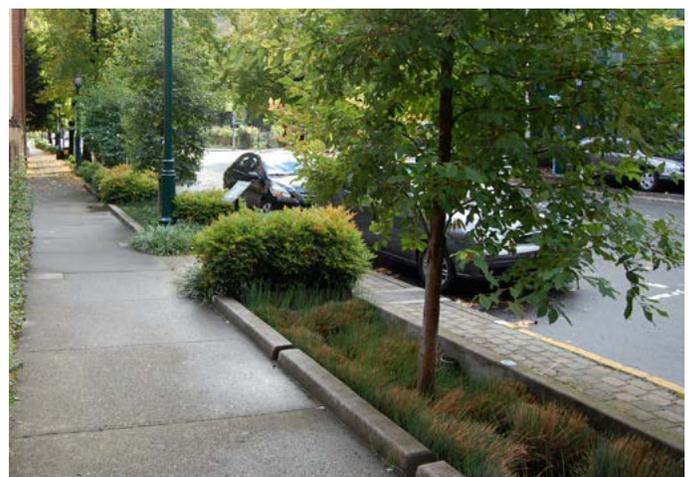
(2). Curb Cut and Landscape Storm Drainage Methods
